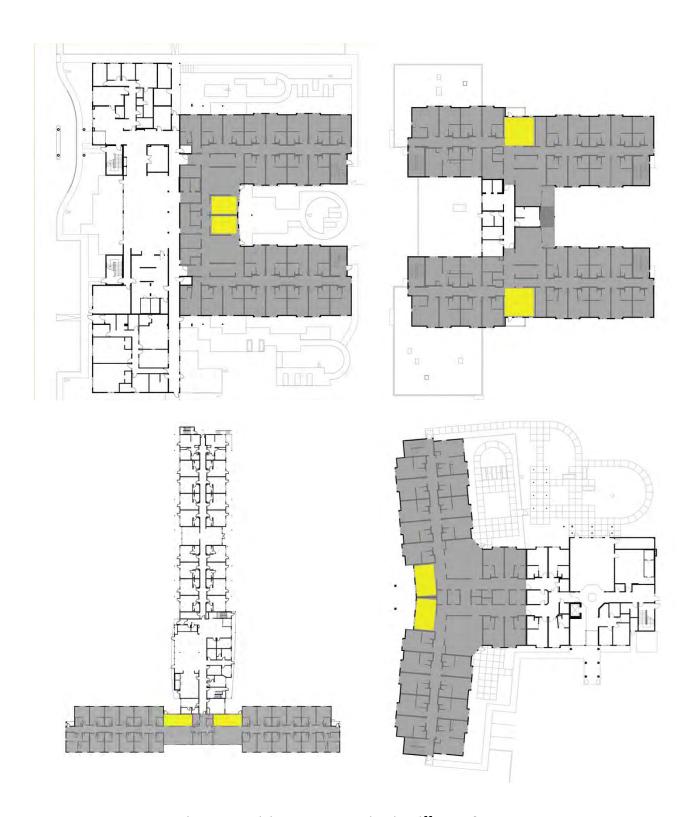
Living Room Location in Different Cottages Cottage living room on the ground floor of Red Deer building (left-up); Cottage living room on the second floor of Red Deer building (right-up); Cottage living room in Wainwright building (left-down); Cottage living room in Slave Lake building (right-down).
